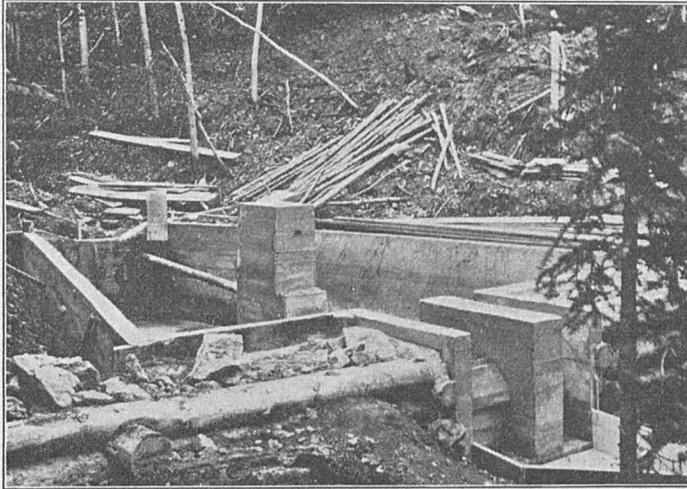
Completed basin at Dam A with rectangular weirs, as seen from downstream end
